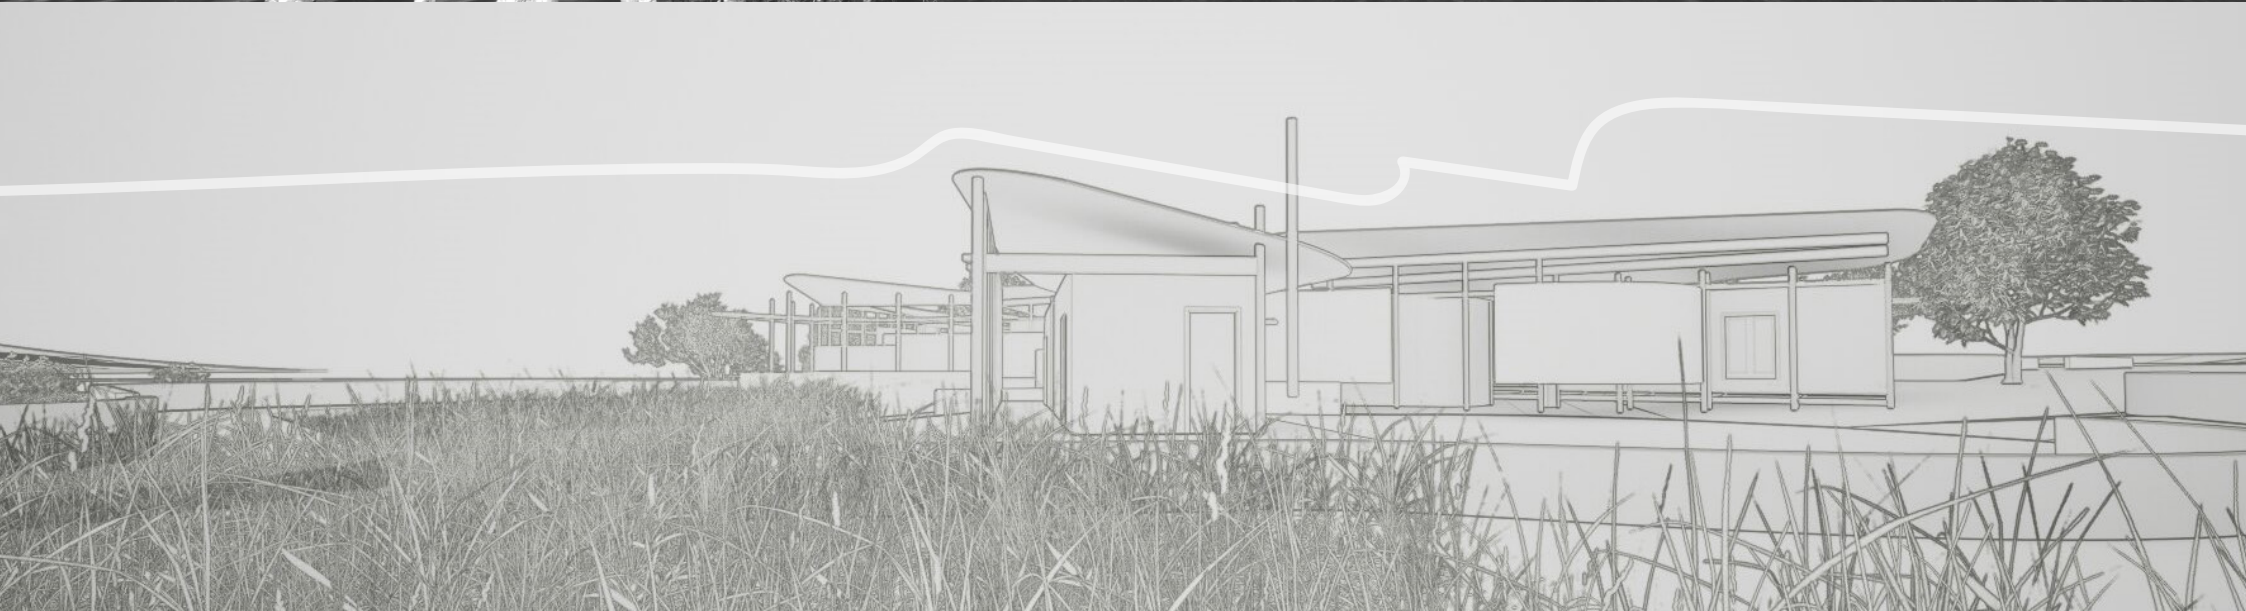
ELEVATION INDICATING INSPIRATION FROM TRAPS (AUTHOR,2023)
